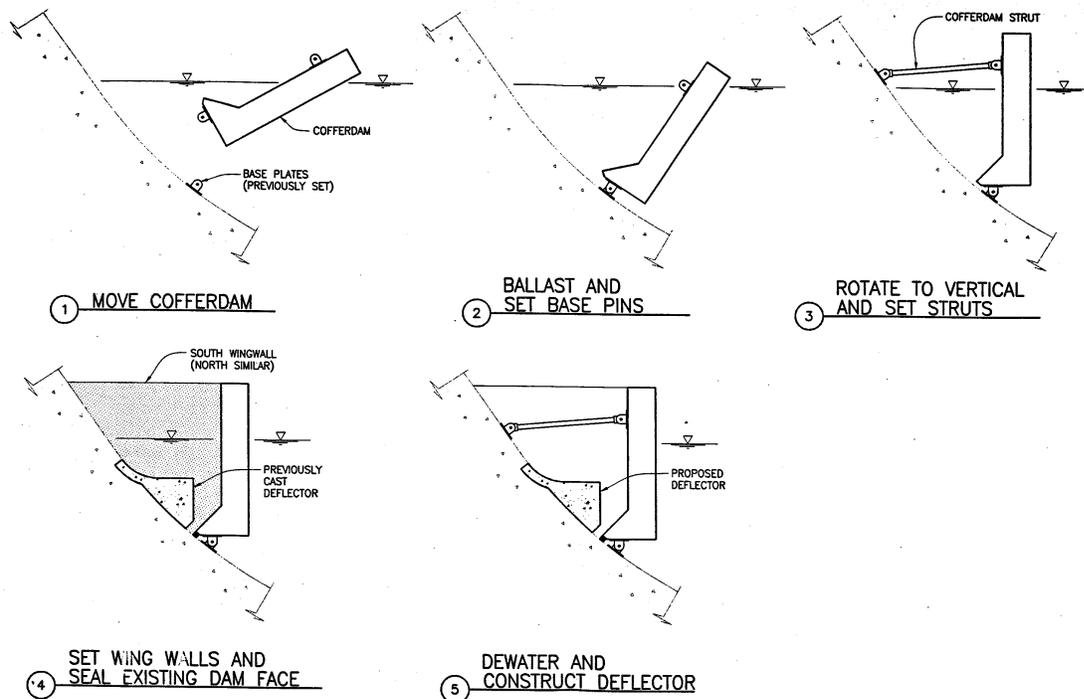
Planned sequence for installing floating cofferdam.
